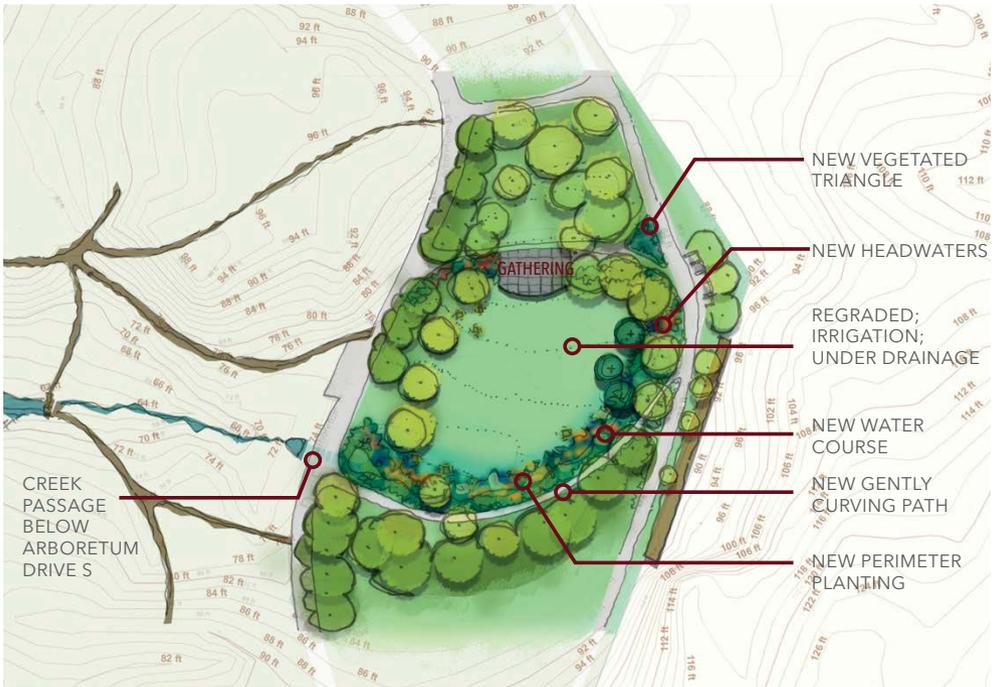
WOODLAND MEADOW, PROPOSED REHABILITATION PLAN
